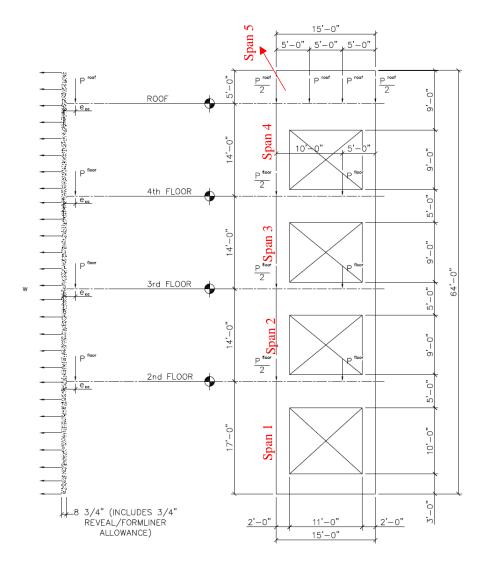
Reinforced Concrete Multi-Story Tilt-Up Wall Panel Geometry
